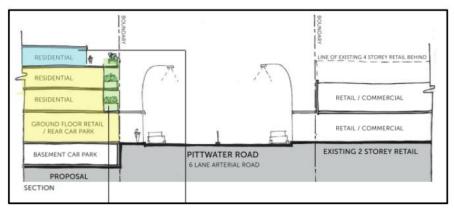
Cross section of Pittwater Road showing the relative sections on the eastern and western side of Pittwater Road
